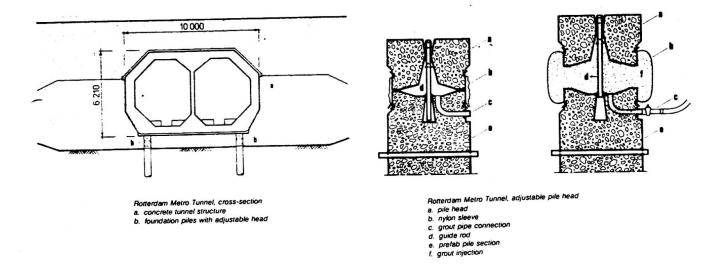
Cross section of Rotterdam subway tunnel and piling system
